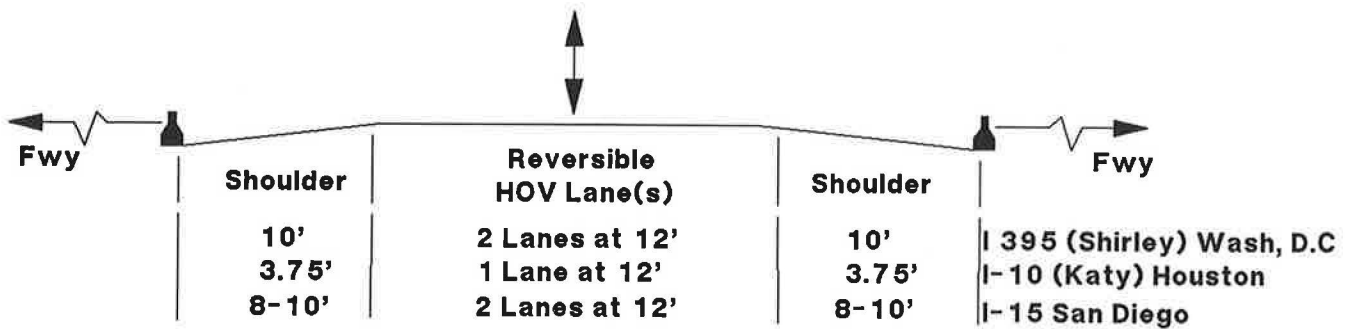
Typical cross sections for reversible HOV facilities in freeway medians.
